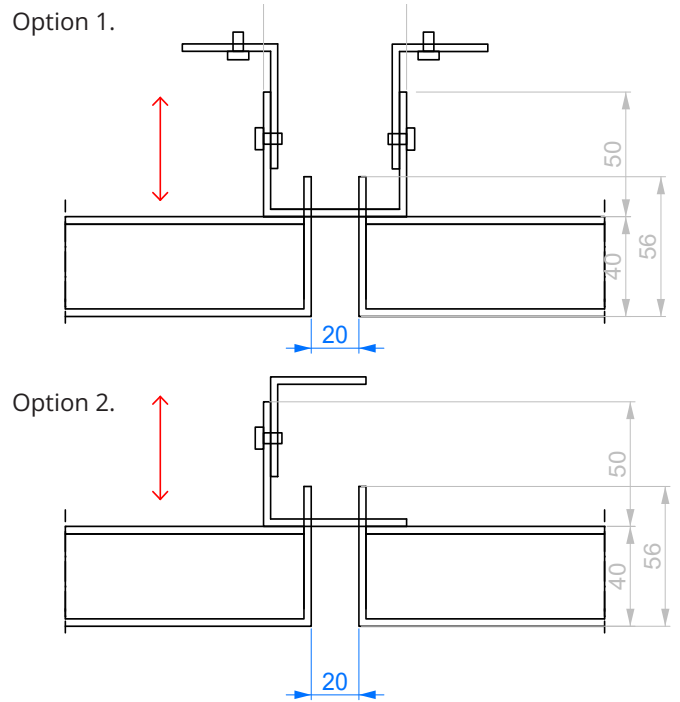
2D Horizontal detail of the connections. Ratio 1:5. (Drawings made by author)
